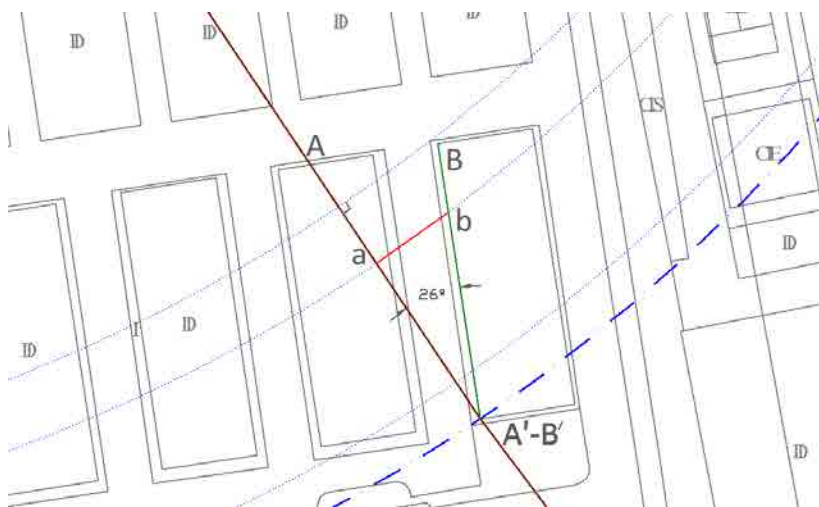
Projection of settlements from the transverse plane to tunnel axis to the building plane.
